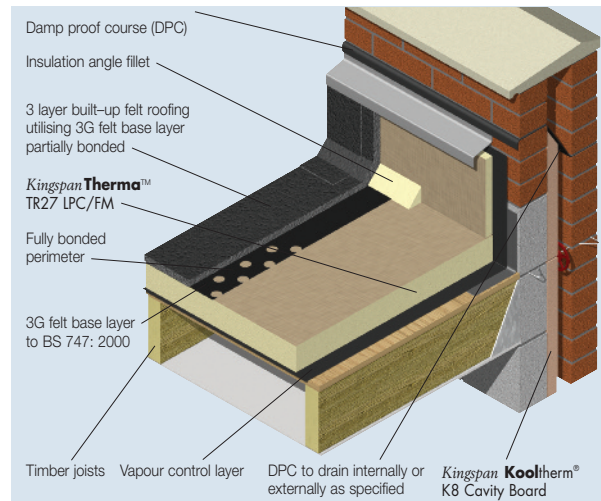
Timber Deck With Suspended Ceiling – Partially Bonded Built-Up Felt Waterproofing
